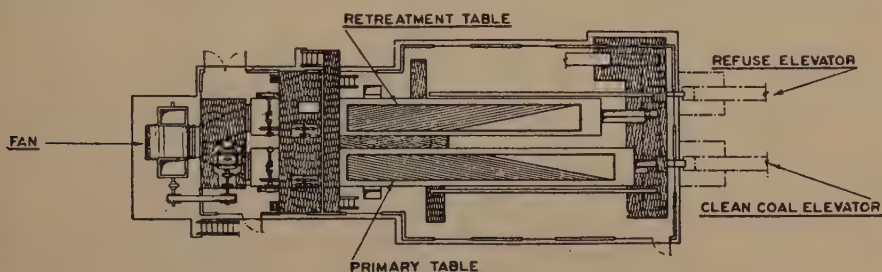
PLAN OF LAYOUT OF PEALE-DAVIS PLANT.
